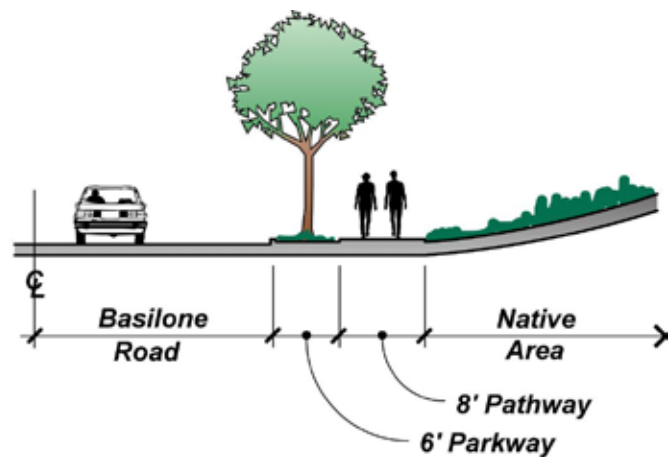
Typical streetscape planting along Basilone Road.
